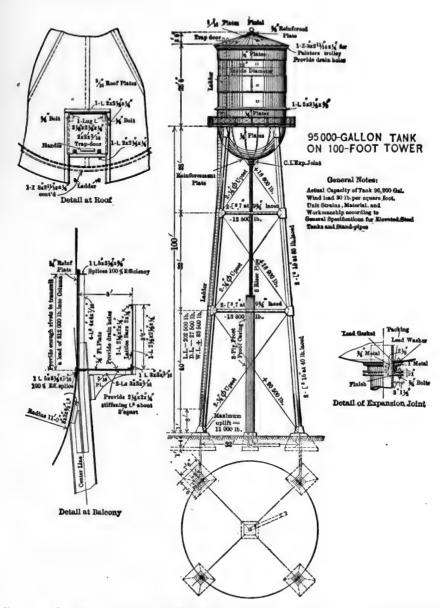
Standard Plan of Elevated Tank on Tower, by C. W. Birch-Nord. (Trans. Am. Soc. C. E., Vol. 64, 1909.)
